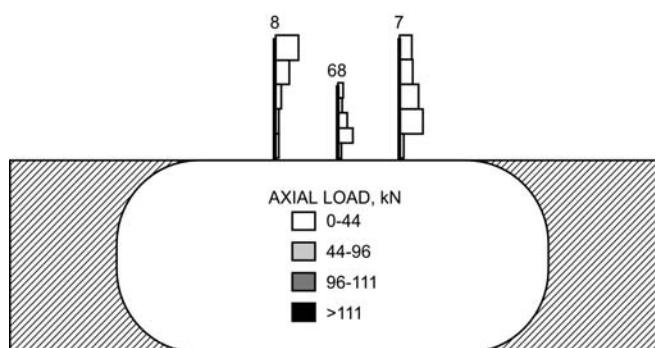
Axial bolt loads at site 1 mid-pillar.
